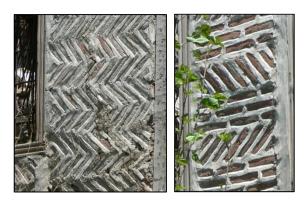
Timber framed wall with herringbone brick composition (left) and alternate use of brick in horizontal and diagonal order (right) (Kubbeli N. b.block-lot: 186-40)
